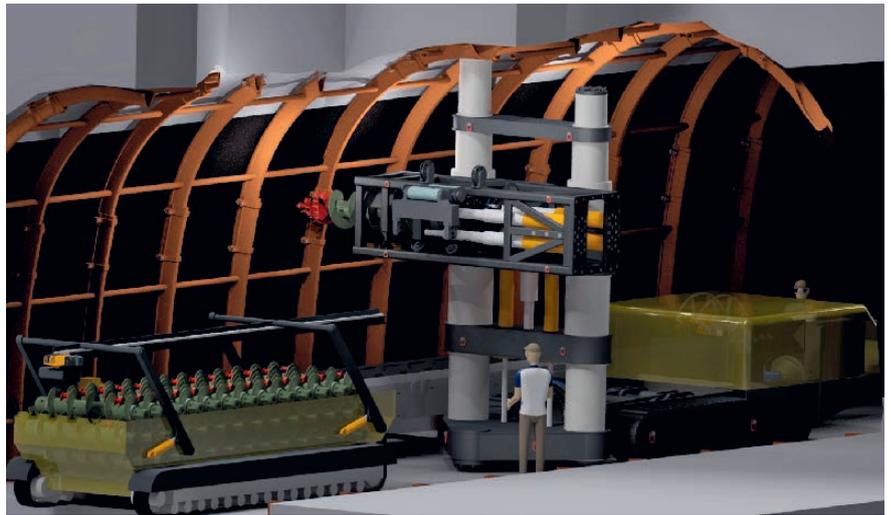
Auger boring machine ABM 80/71MX in a mining roadway. // Bild 9. Auger Boring machine ABM 80/71MX in einer Abbaubegleitstrecke. Photo/Foto: Perforator
